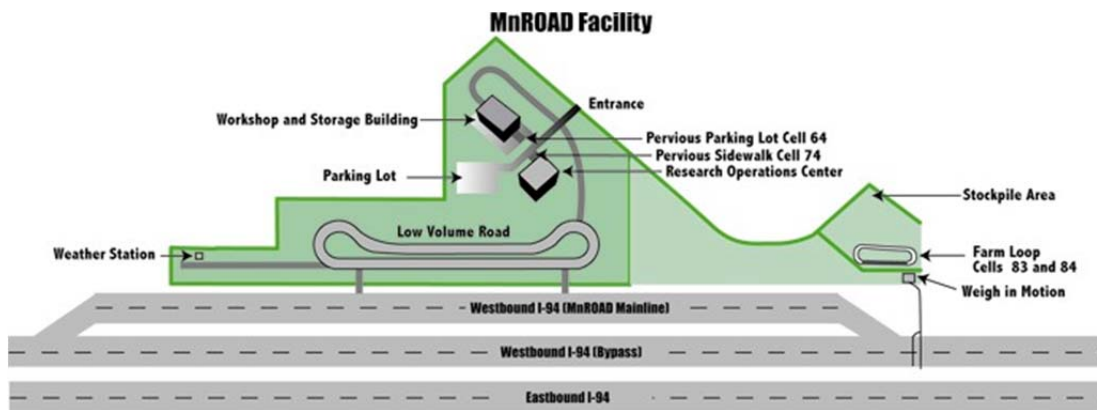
MnROAD Facility Layout (<http://www.dot.state.mn.us>)
